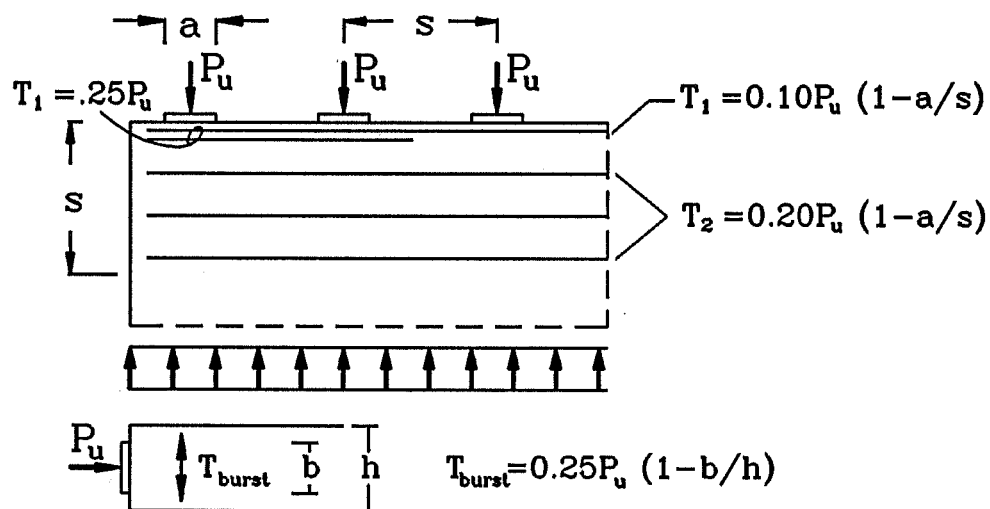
Reinforcement Requirements for Multiple Slab Anchorages
